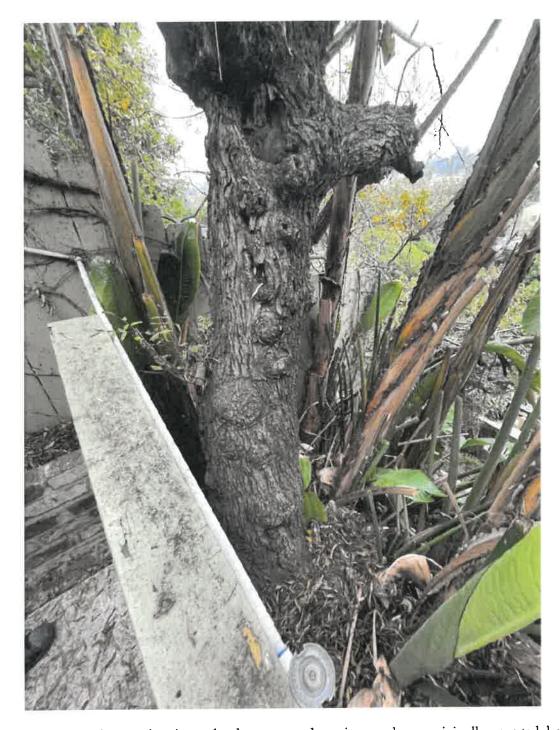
This tree is growing in a slender space where it may have originally erupted between the concrete steps and a slope retaining wall. This tree has grown with a restricted root zone, and caused heaving and shifting of the concrete infrastructure surrounding it. This tree has extensive decay pockets throughout its canopy, and over the years been pruned aggressively in an attempt to retain the dedicated size. This tree is in poor condition and is a removal candidate.
